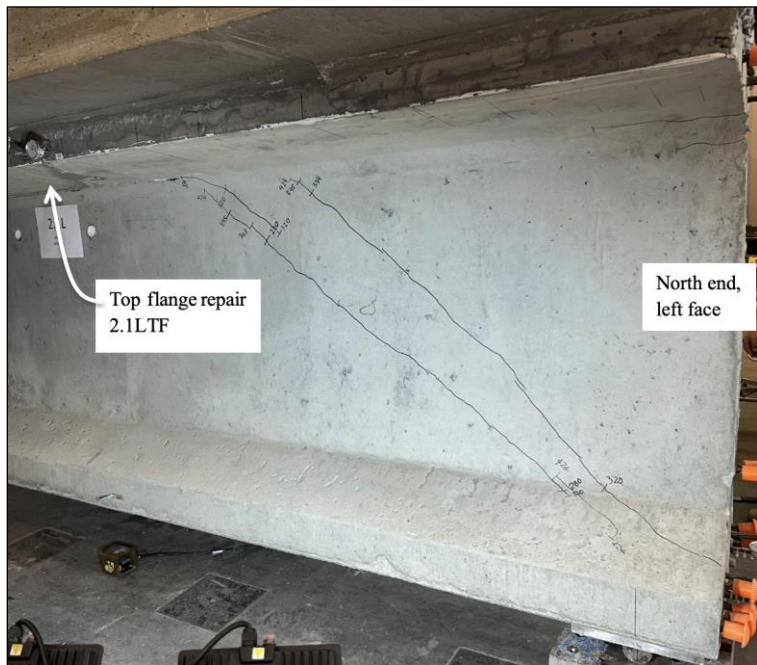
Photo. Test 2.1.S (repair 2.1RTF, 2.1LTF) shear cracks to the right of repair 2.1LTF (left face of girder pictured).
